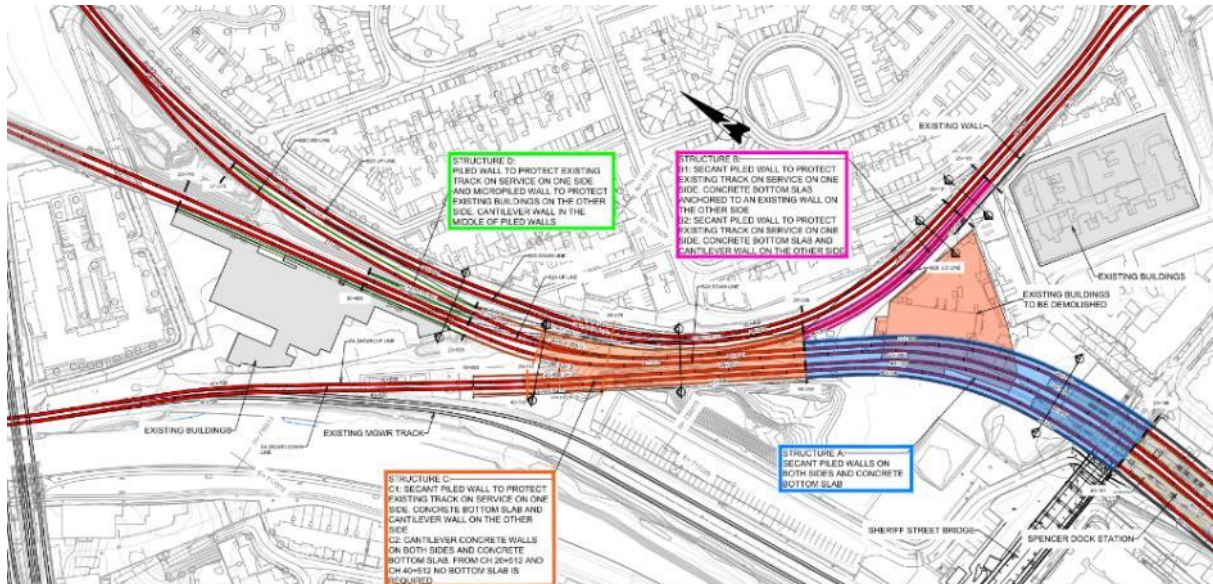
Spencer Dock proposed walls and protection slabs with the final track alignment
